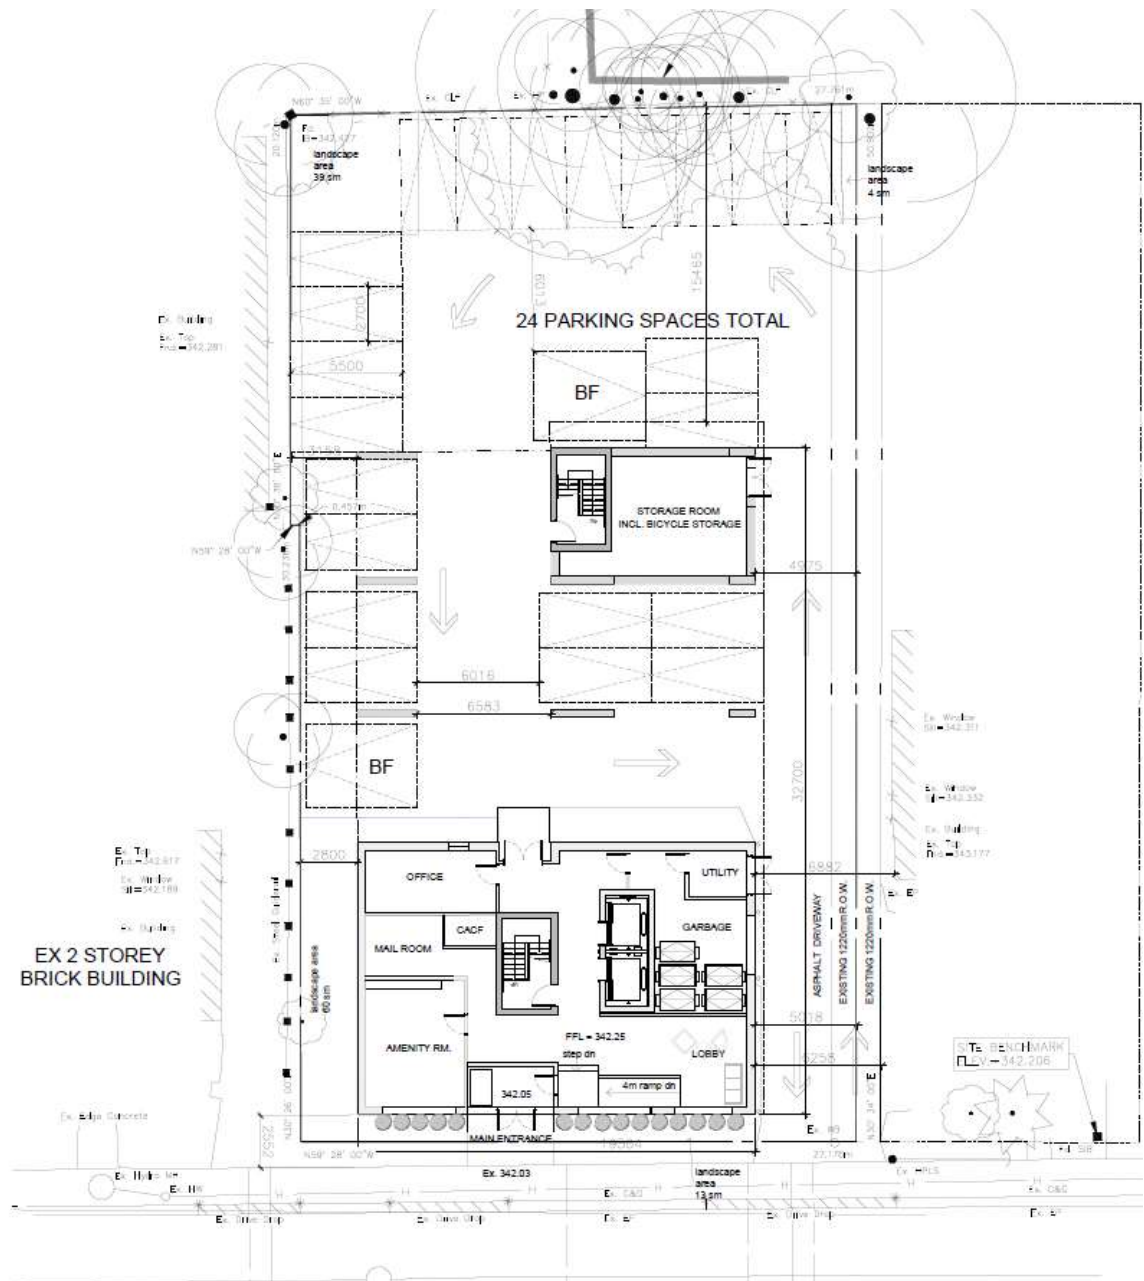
Proposed Site Plan. (Source: +VH Architects, The Ventin Group Ltd., 2021)
